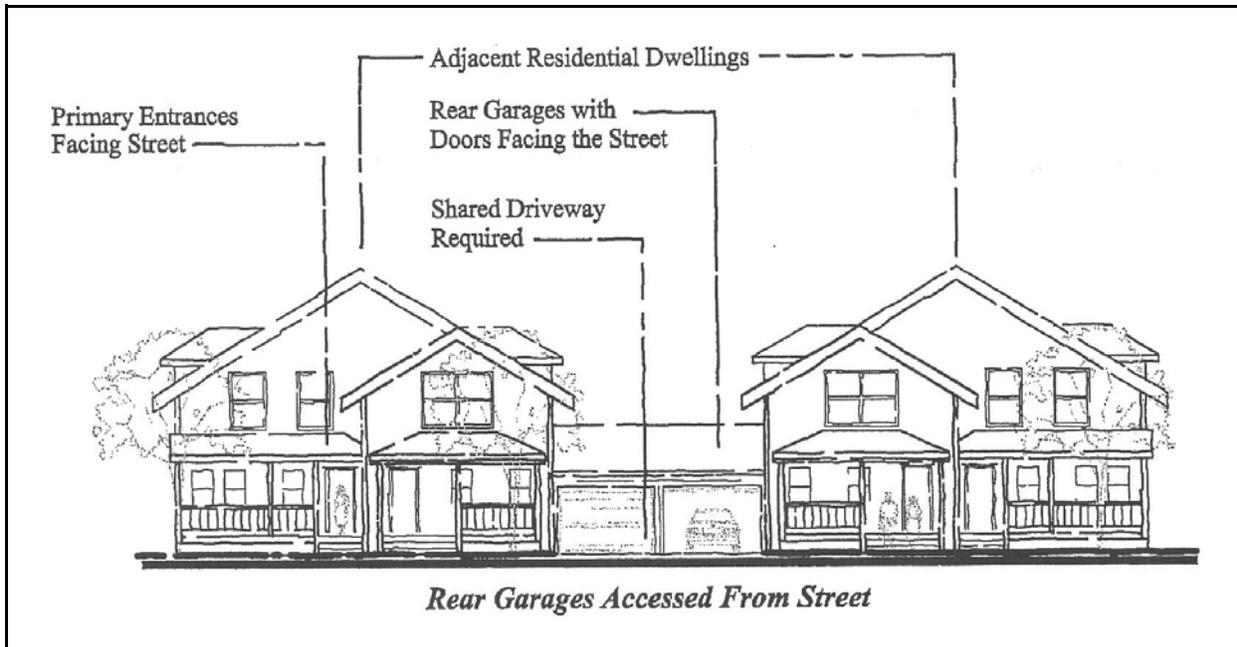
4 - Rear Garage Accessed from the Street
